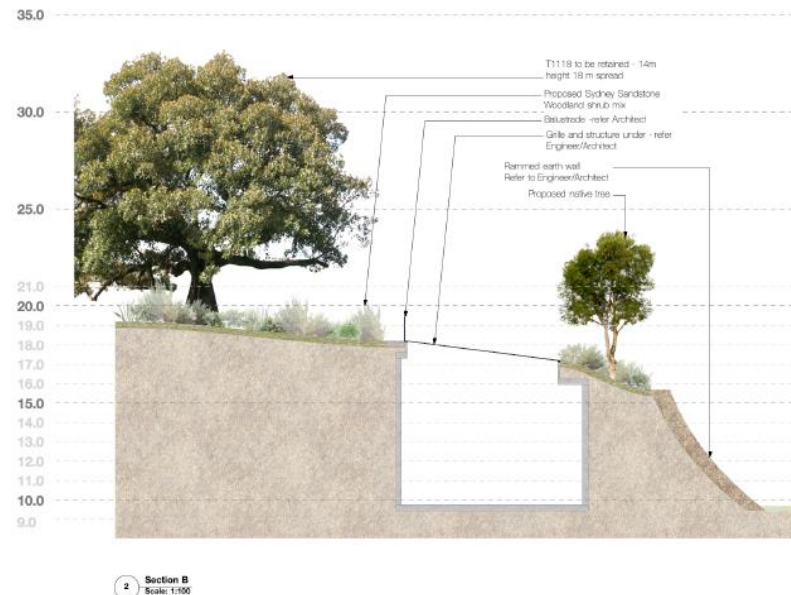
Section B – Cooling Tower Sections (Scale 1:100)
